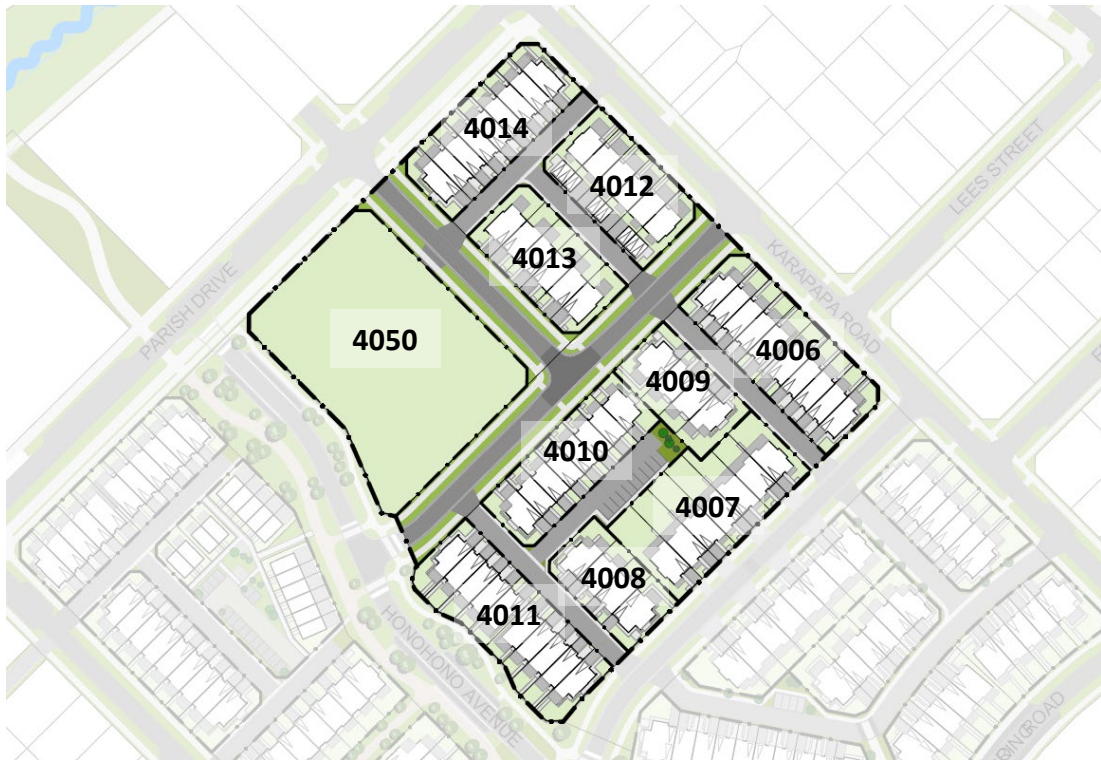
Stage 4C-3 Masterplan (source: Woods)
